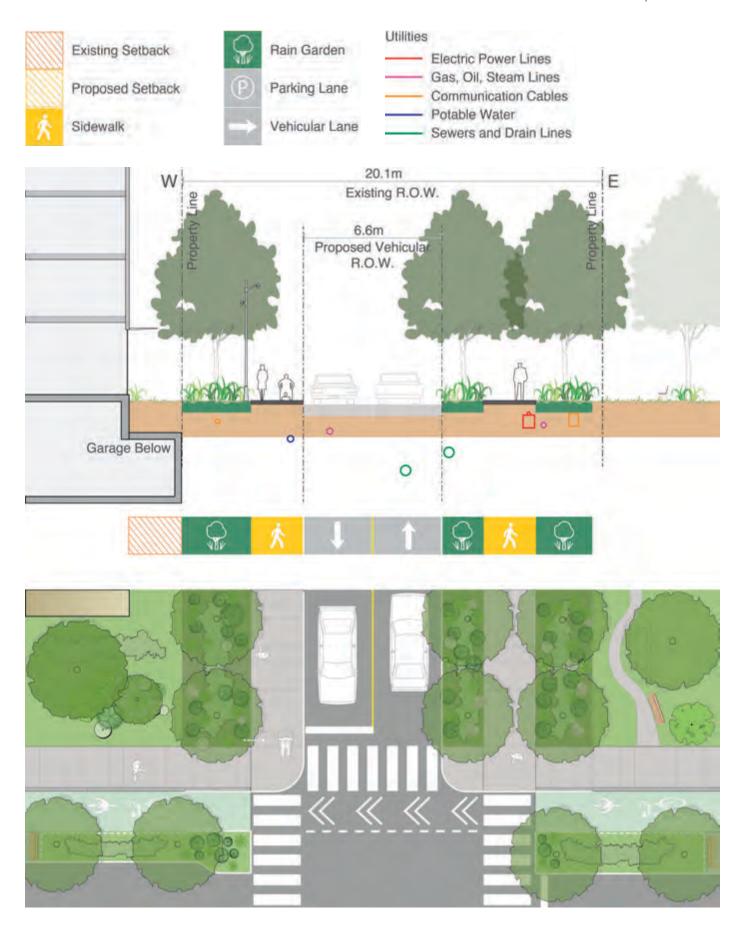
Section and Plan of Redpath Revisited - Recommended Final Condition of bump-out at intersection with Broadway Avenue
